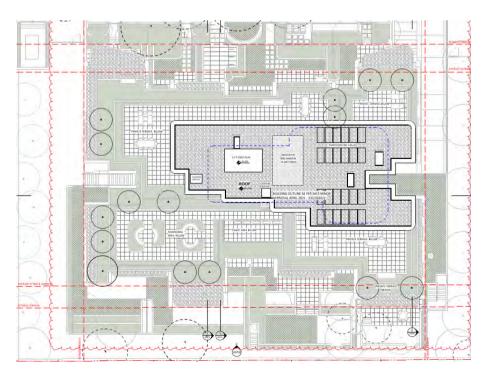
DA232/2020/3 s4.55(2) modification amended proposed roof plan
